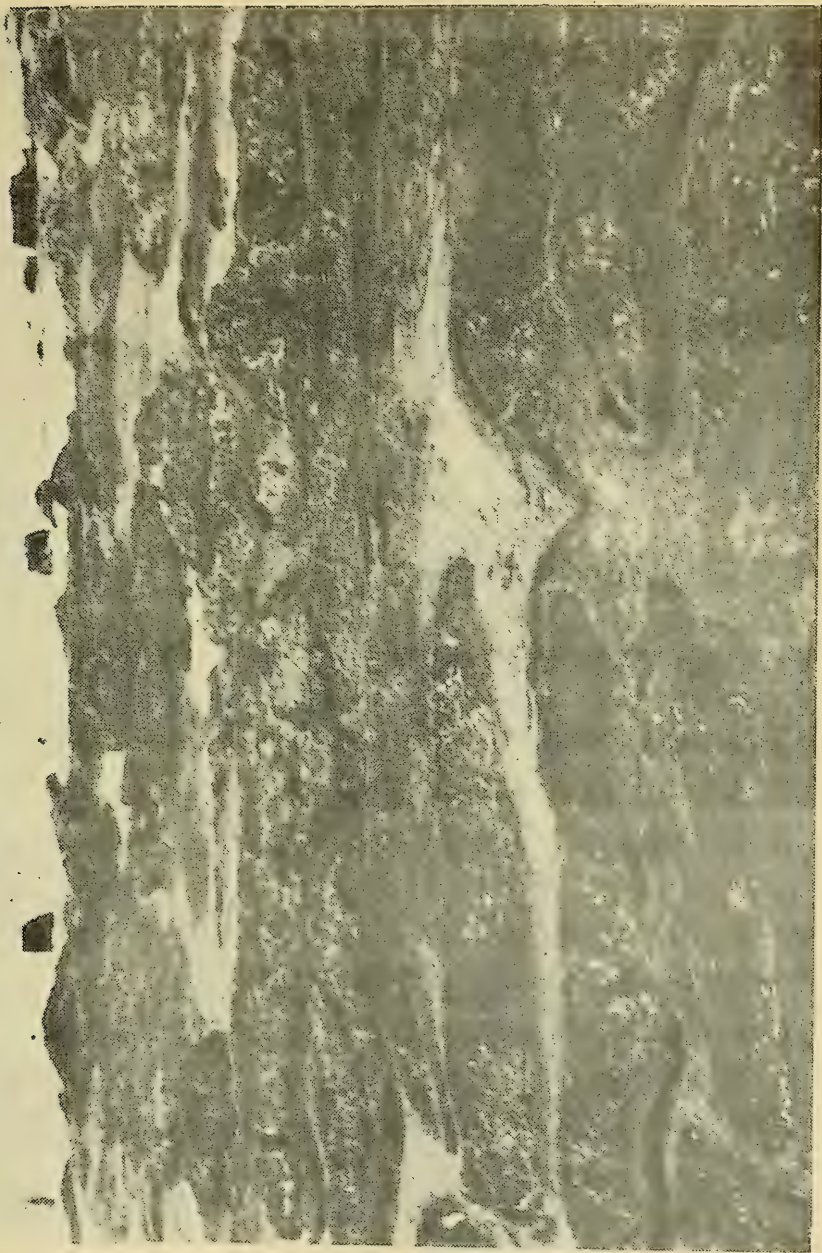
End of the north pier at Hook of Holland. Part of heavily attached stone protection with grouting applied in autumn of 1947.
